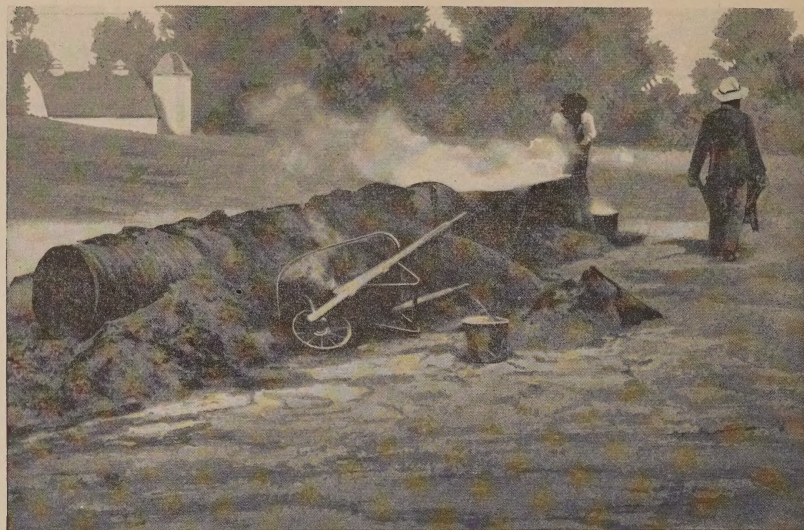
Method of heating sand, gravel and water for mixing concrete. Notice section of old sheet iron culvert pipe covered with sand and gravel; fire is built inside of the pipe. At rear is old cauldron for heating the mixing water with fire built underneath.
